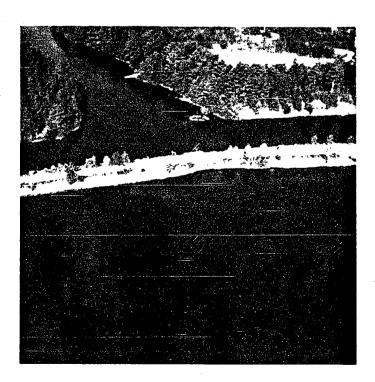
Cooling Water Canal at Ash Pond Dam. Note Sluice Structure in Dike (center of photo).
